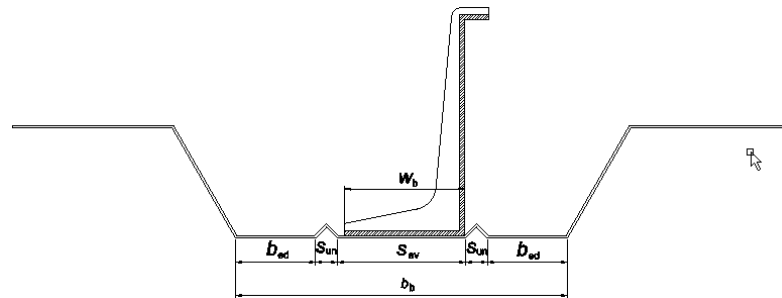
Transverse sheeting with two rib stiffeners and parallel connectors.
